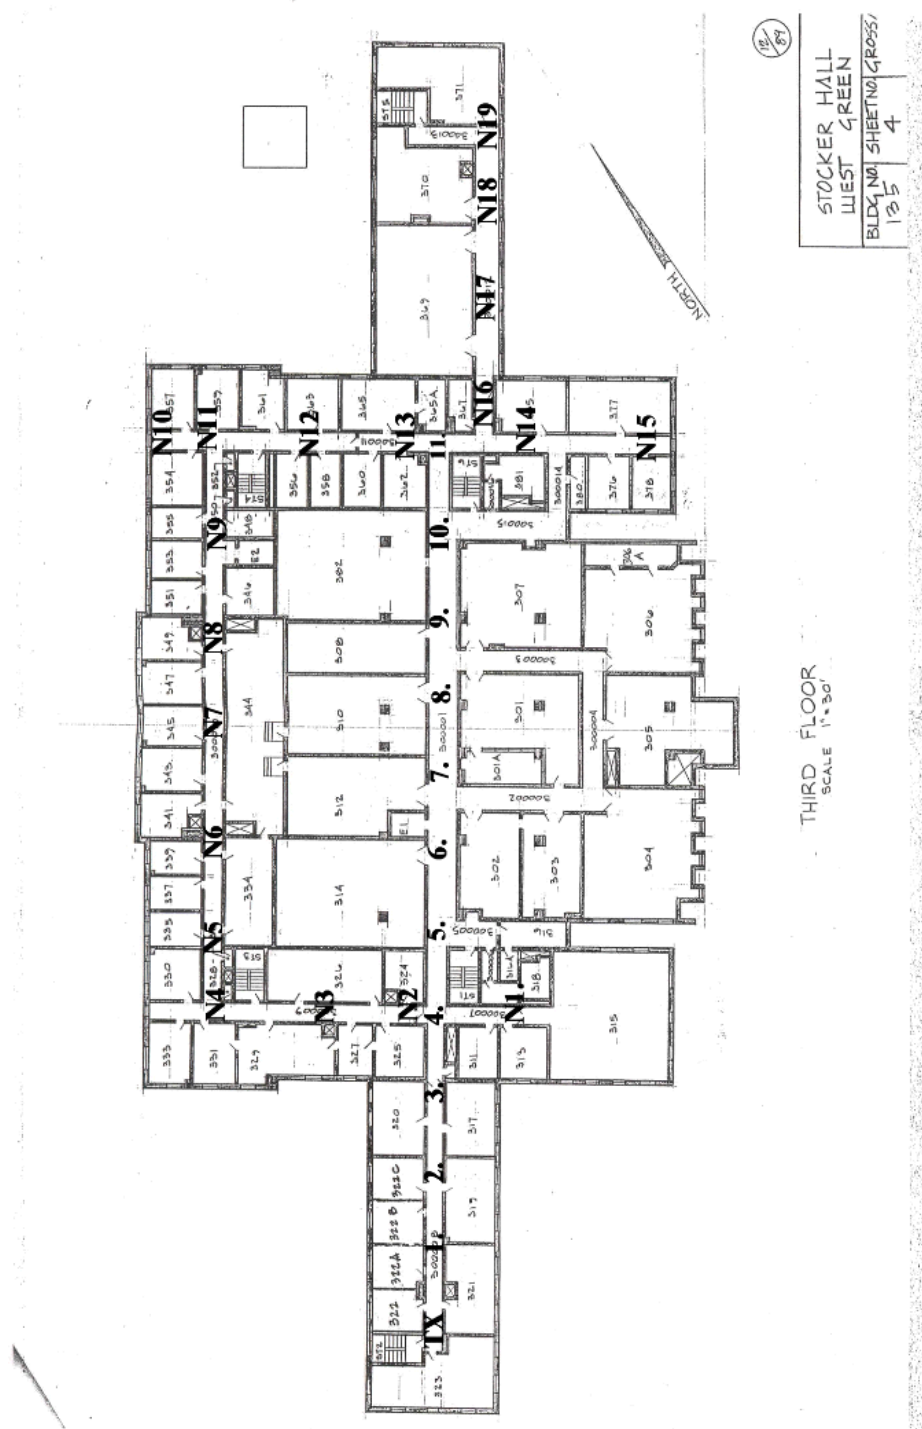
Layout of floor plan of third floor with transmitter and receiver locations.
